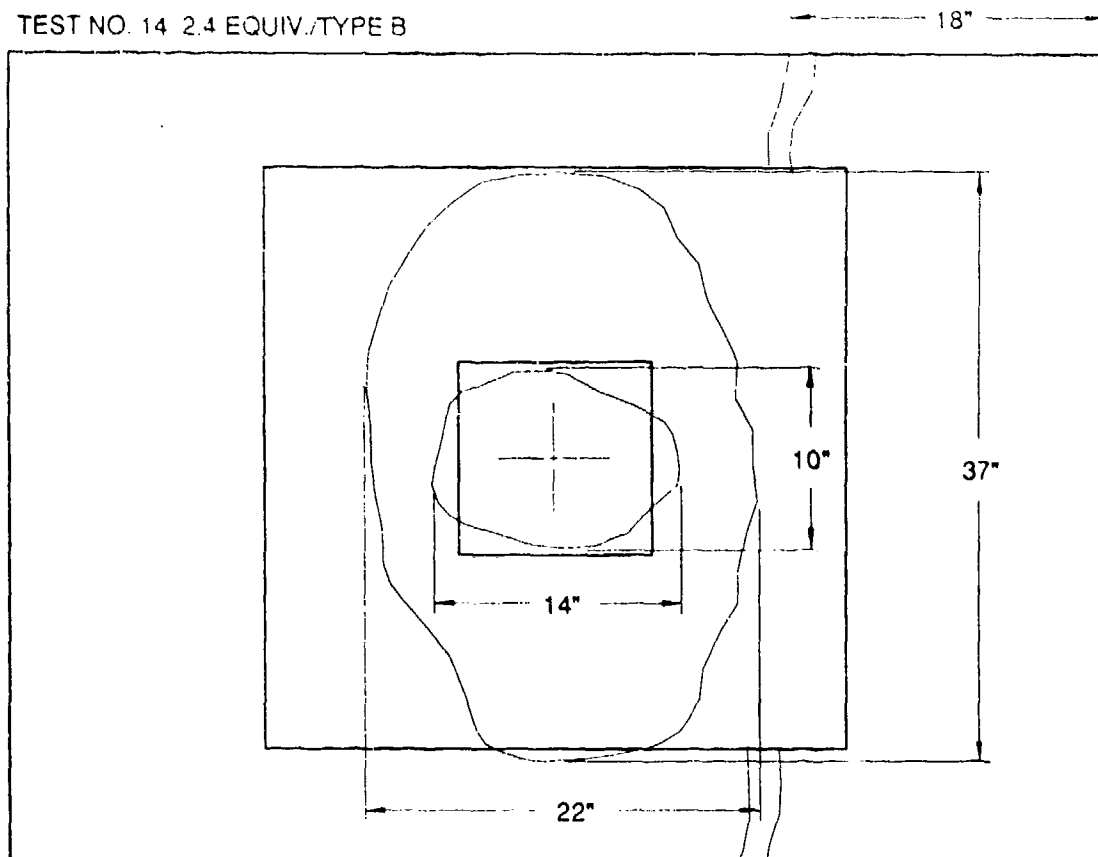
A Schematic of Test 14 Wall Damage (Type B, 2.4-Pound Equivalent Charge).
